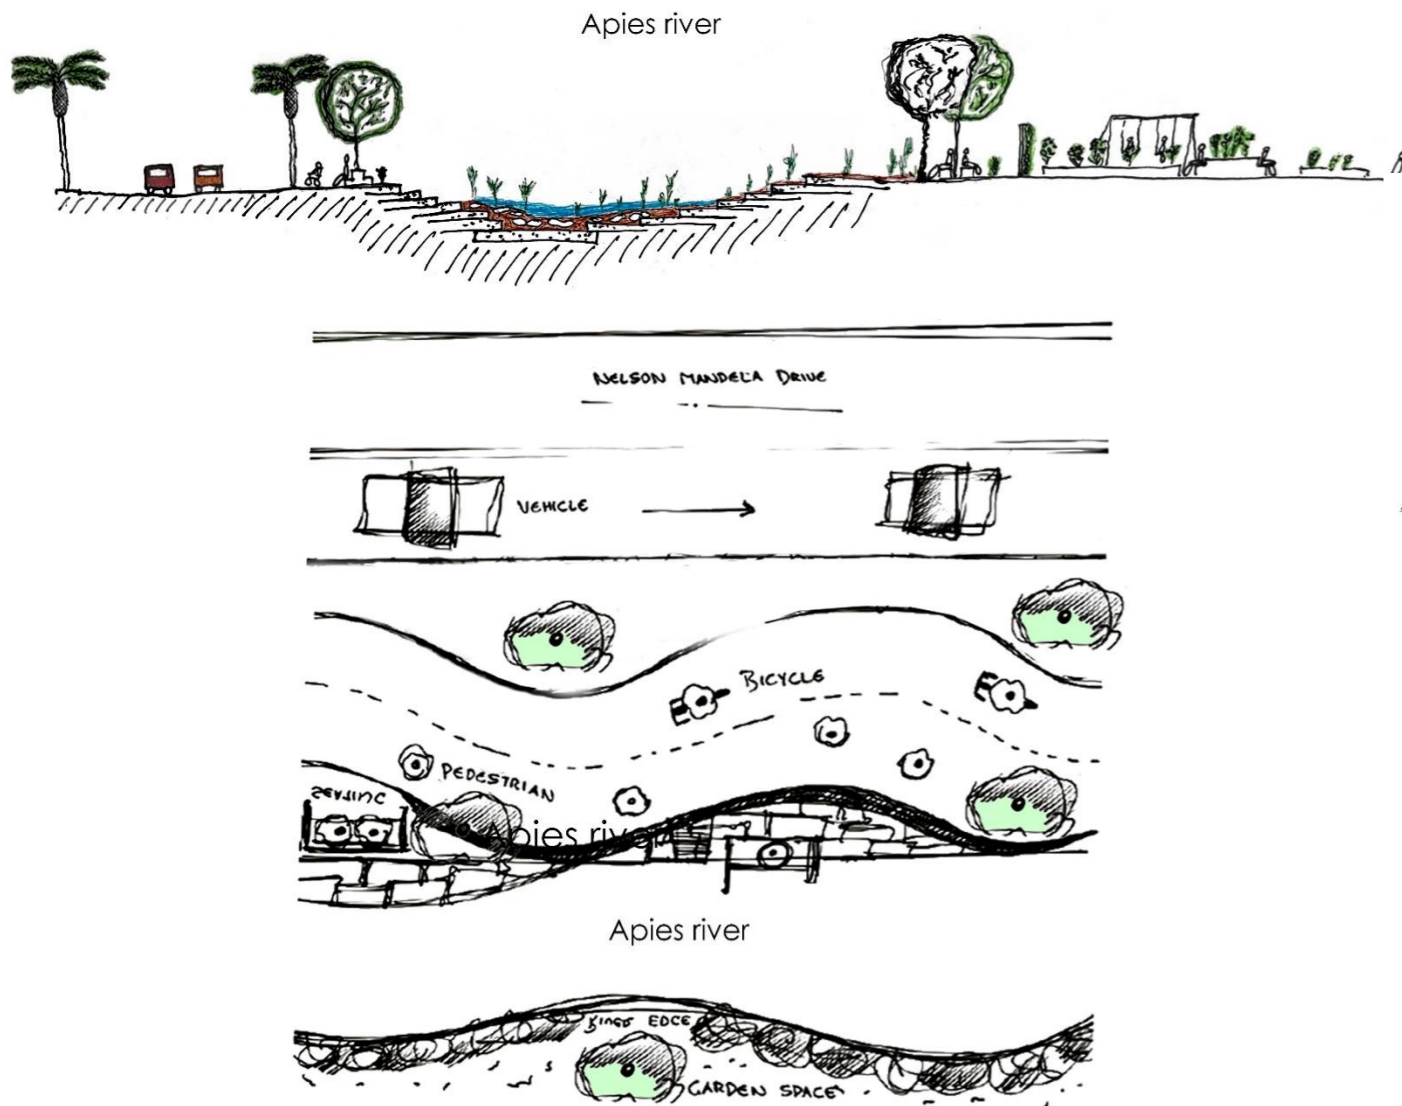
Apies river edge transformation and activation section and Plan view (Author, 2024).
